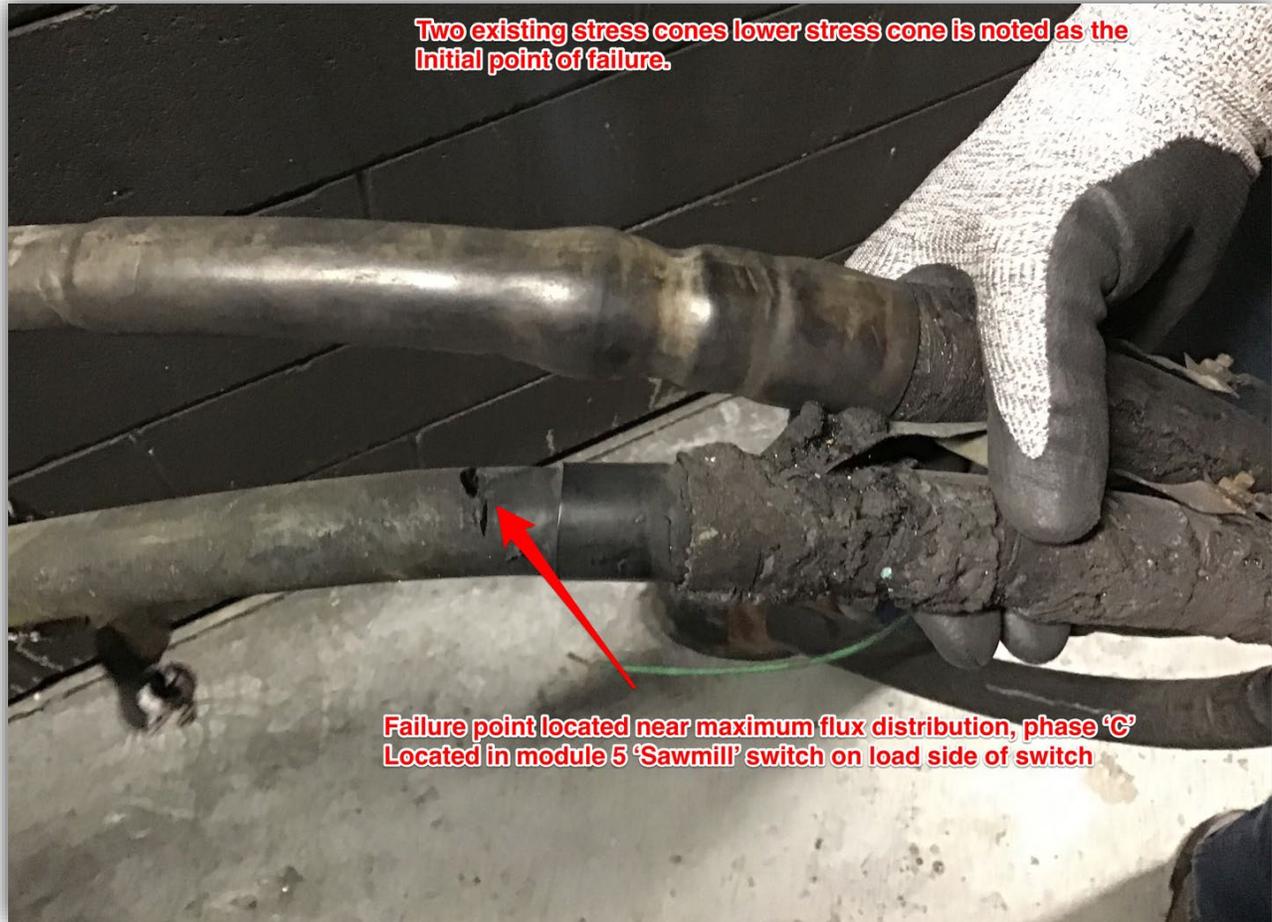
Two of the stress cones cut out from Modules #5 with failed cable noting location of fault within the stress cone.
